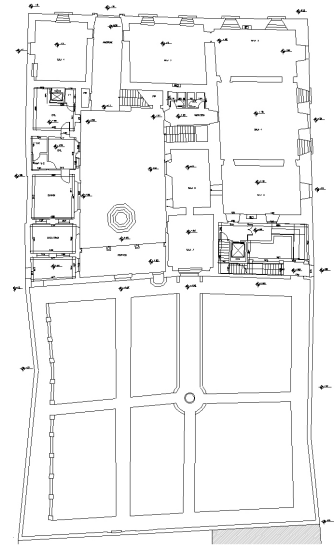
First (ground-level) floor plan of the Palazzo Spinola in Foligno, Umbria.
